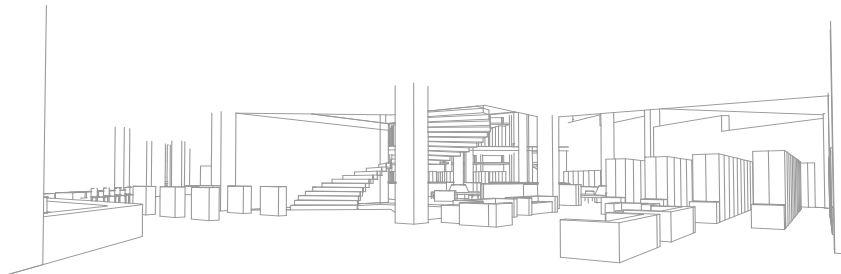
View through first floor reading area to main stairs (Daniela Teran).
